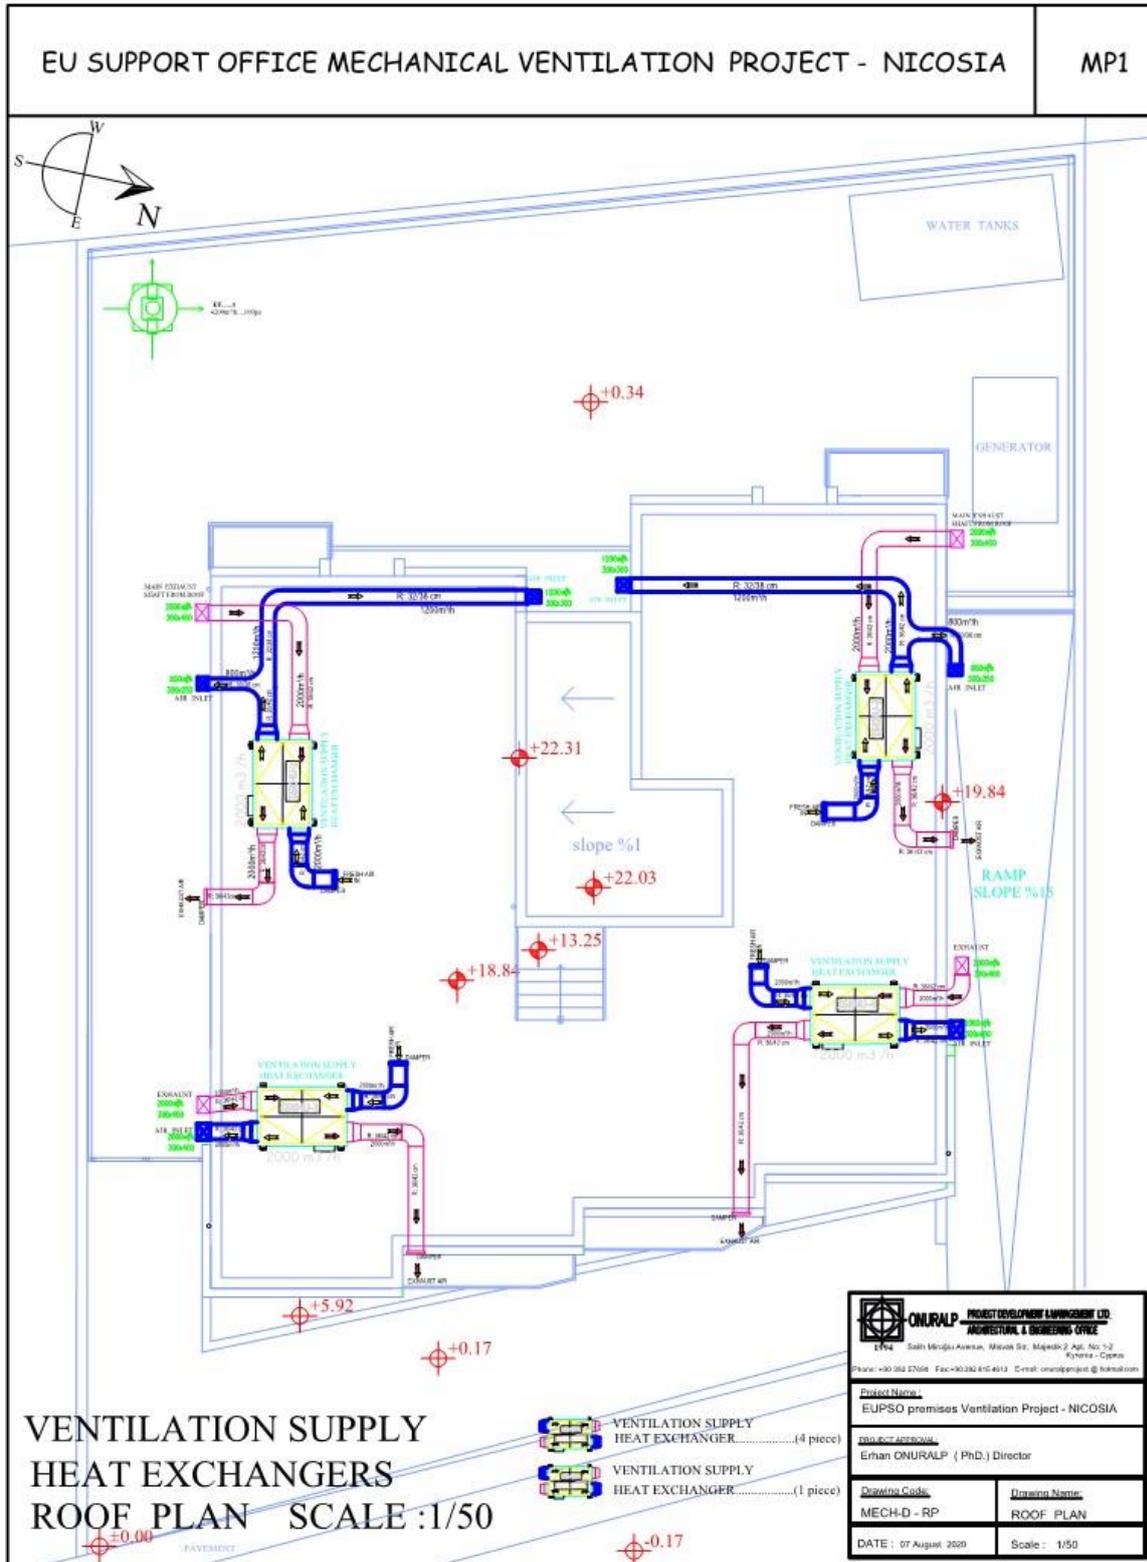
Roof plan with Ventilation Supply Heat Exchangers EUPSÖ project planning MP1
